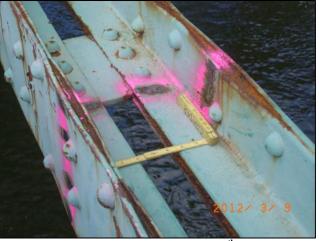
Span 2 Left Truss - L2L3 at 5<sup>th</sup> tie plate: Section loss <12-0315>
